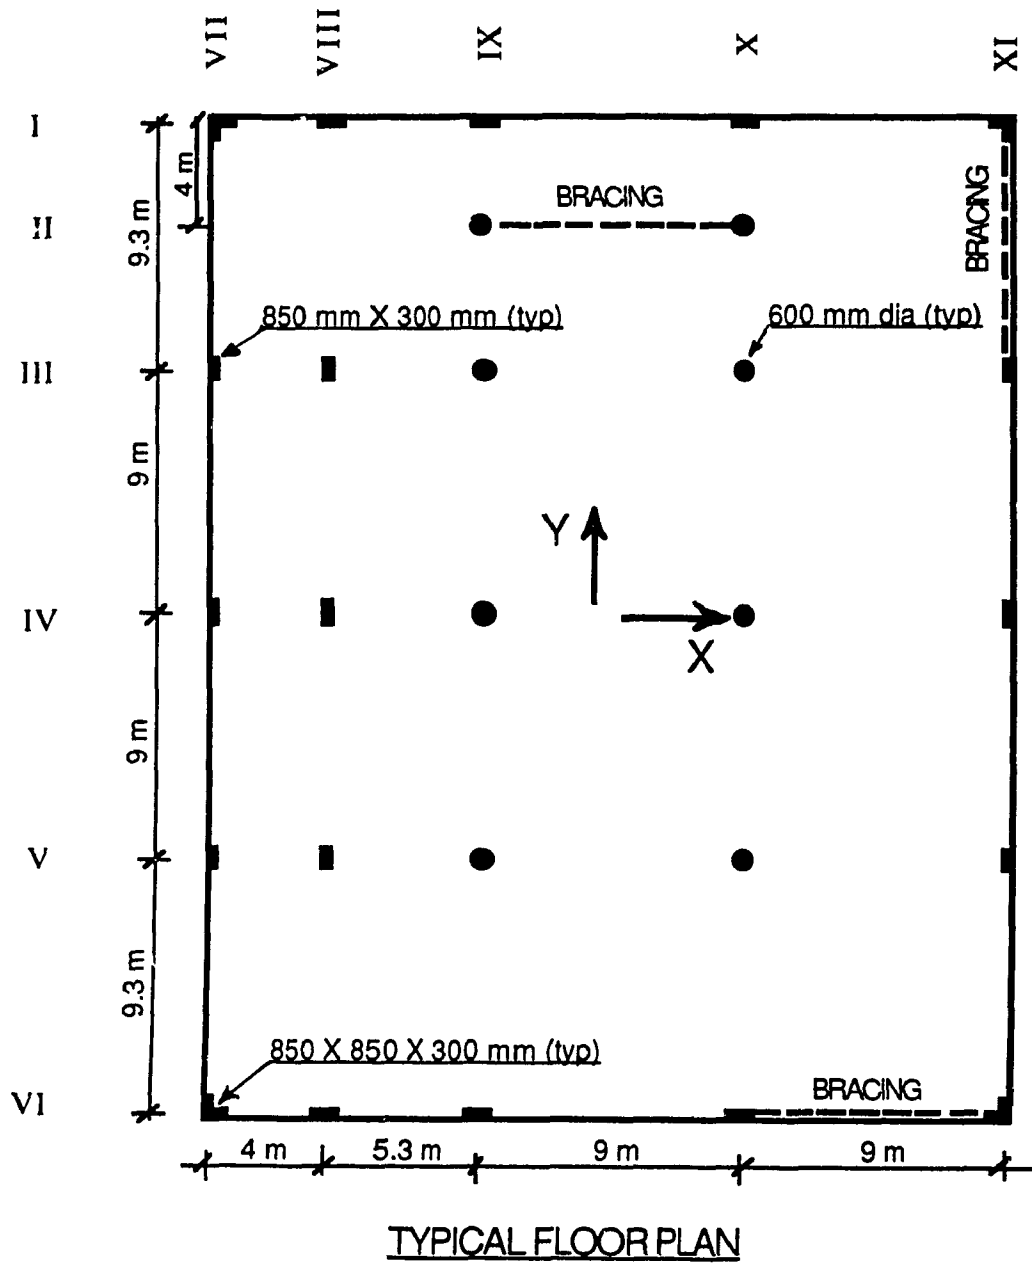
Floor Plan of the 5 Storey Library Building
